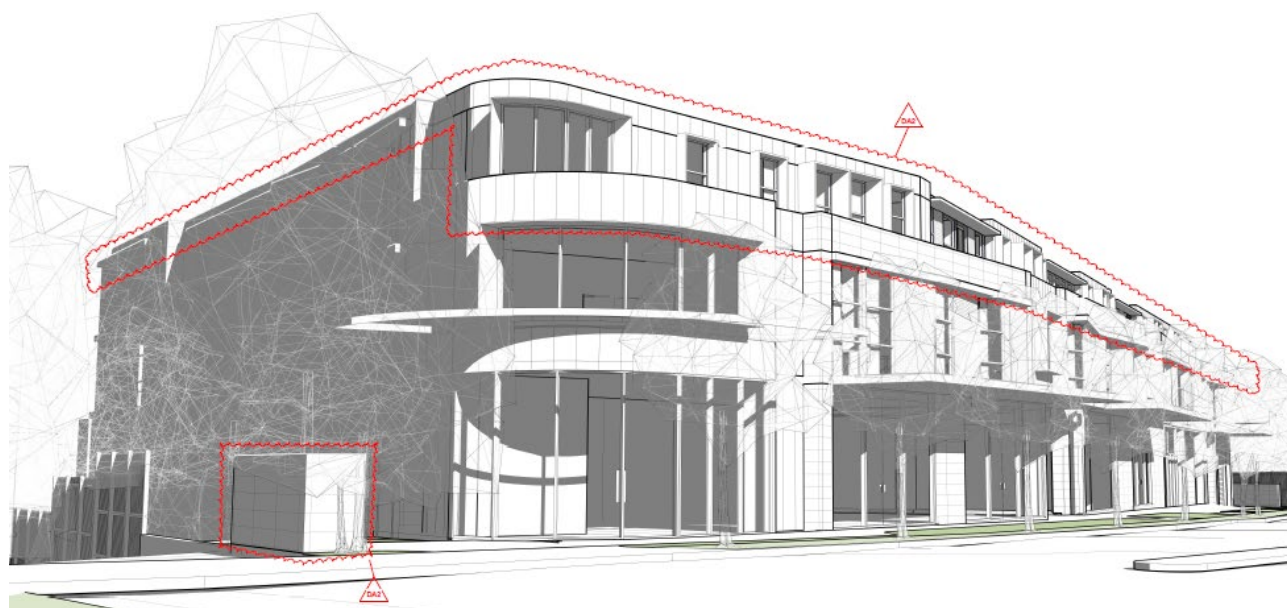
River Road – looking south (Source: Drawing DA505, Revision DA2, MDP Architects).
